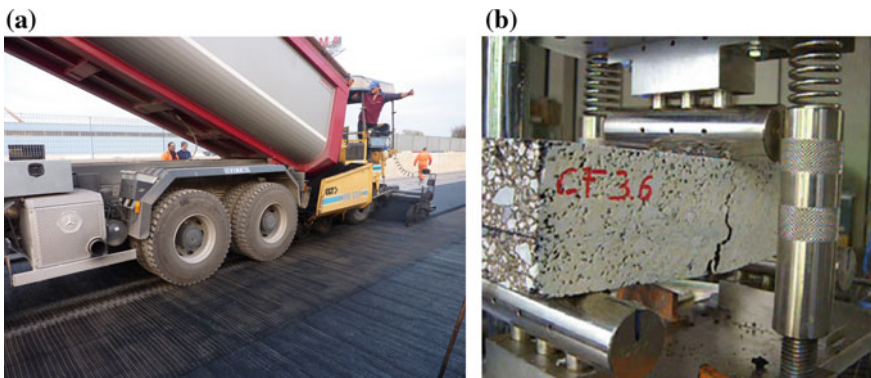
a Example of a full-scale paving equipment and grid installation; b 3-point bending tests on reinforced system
